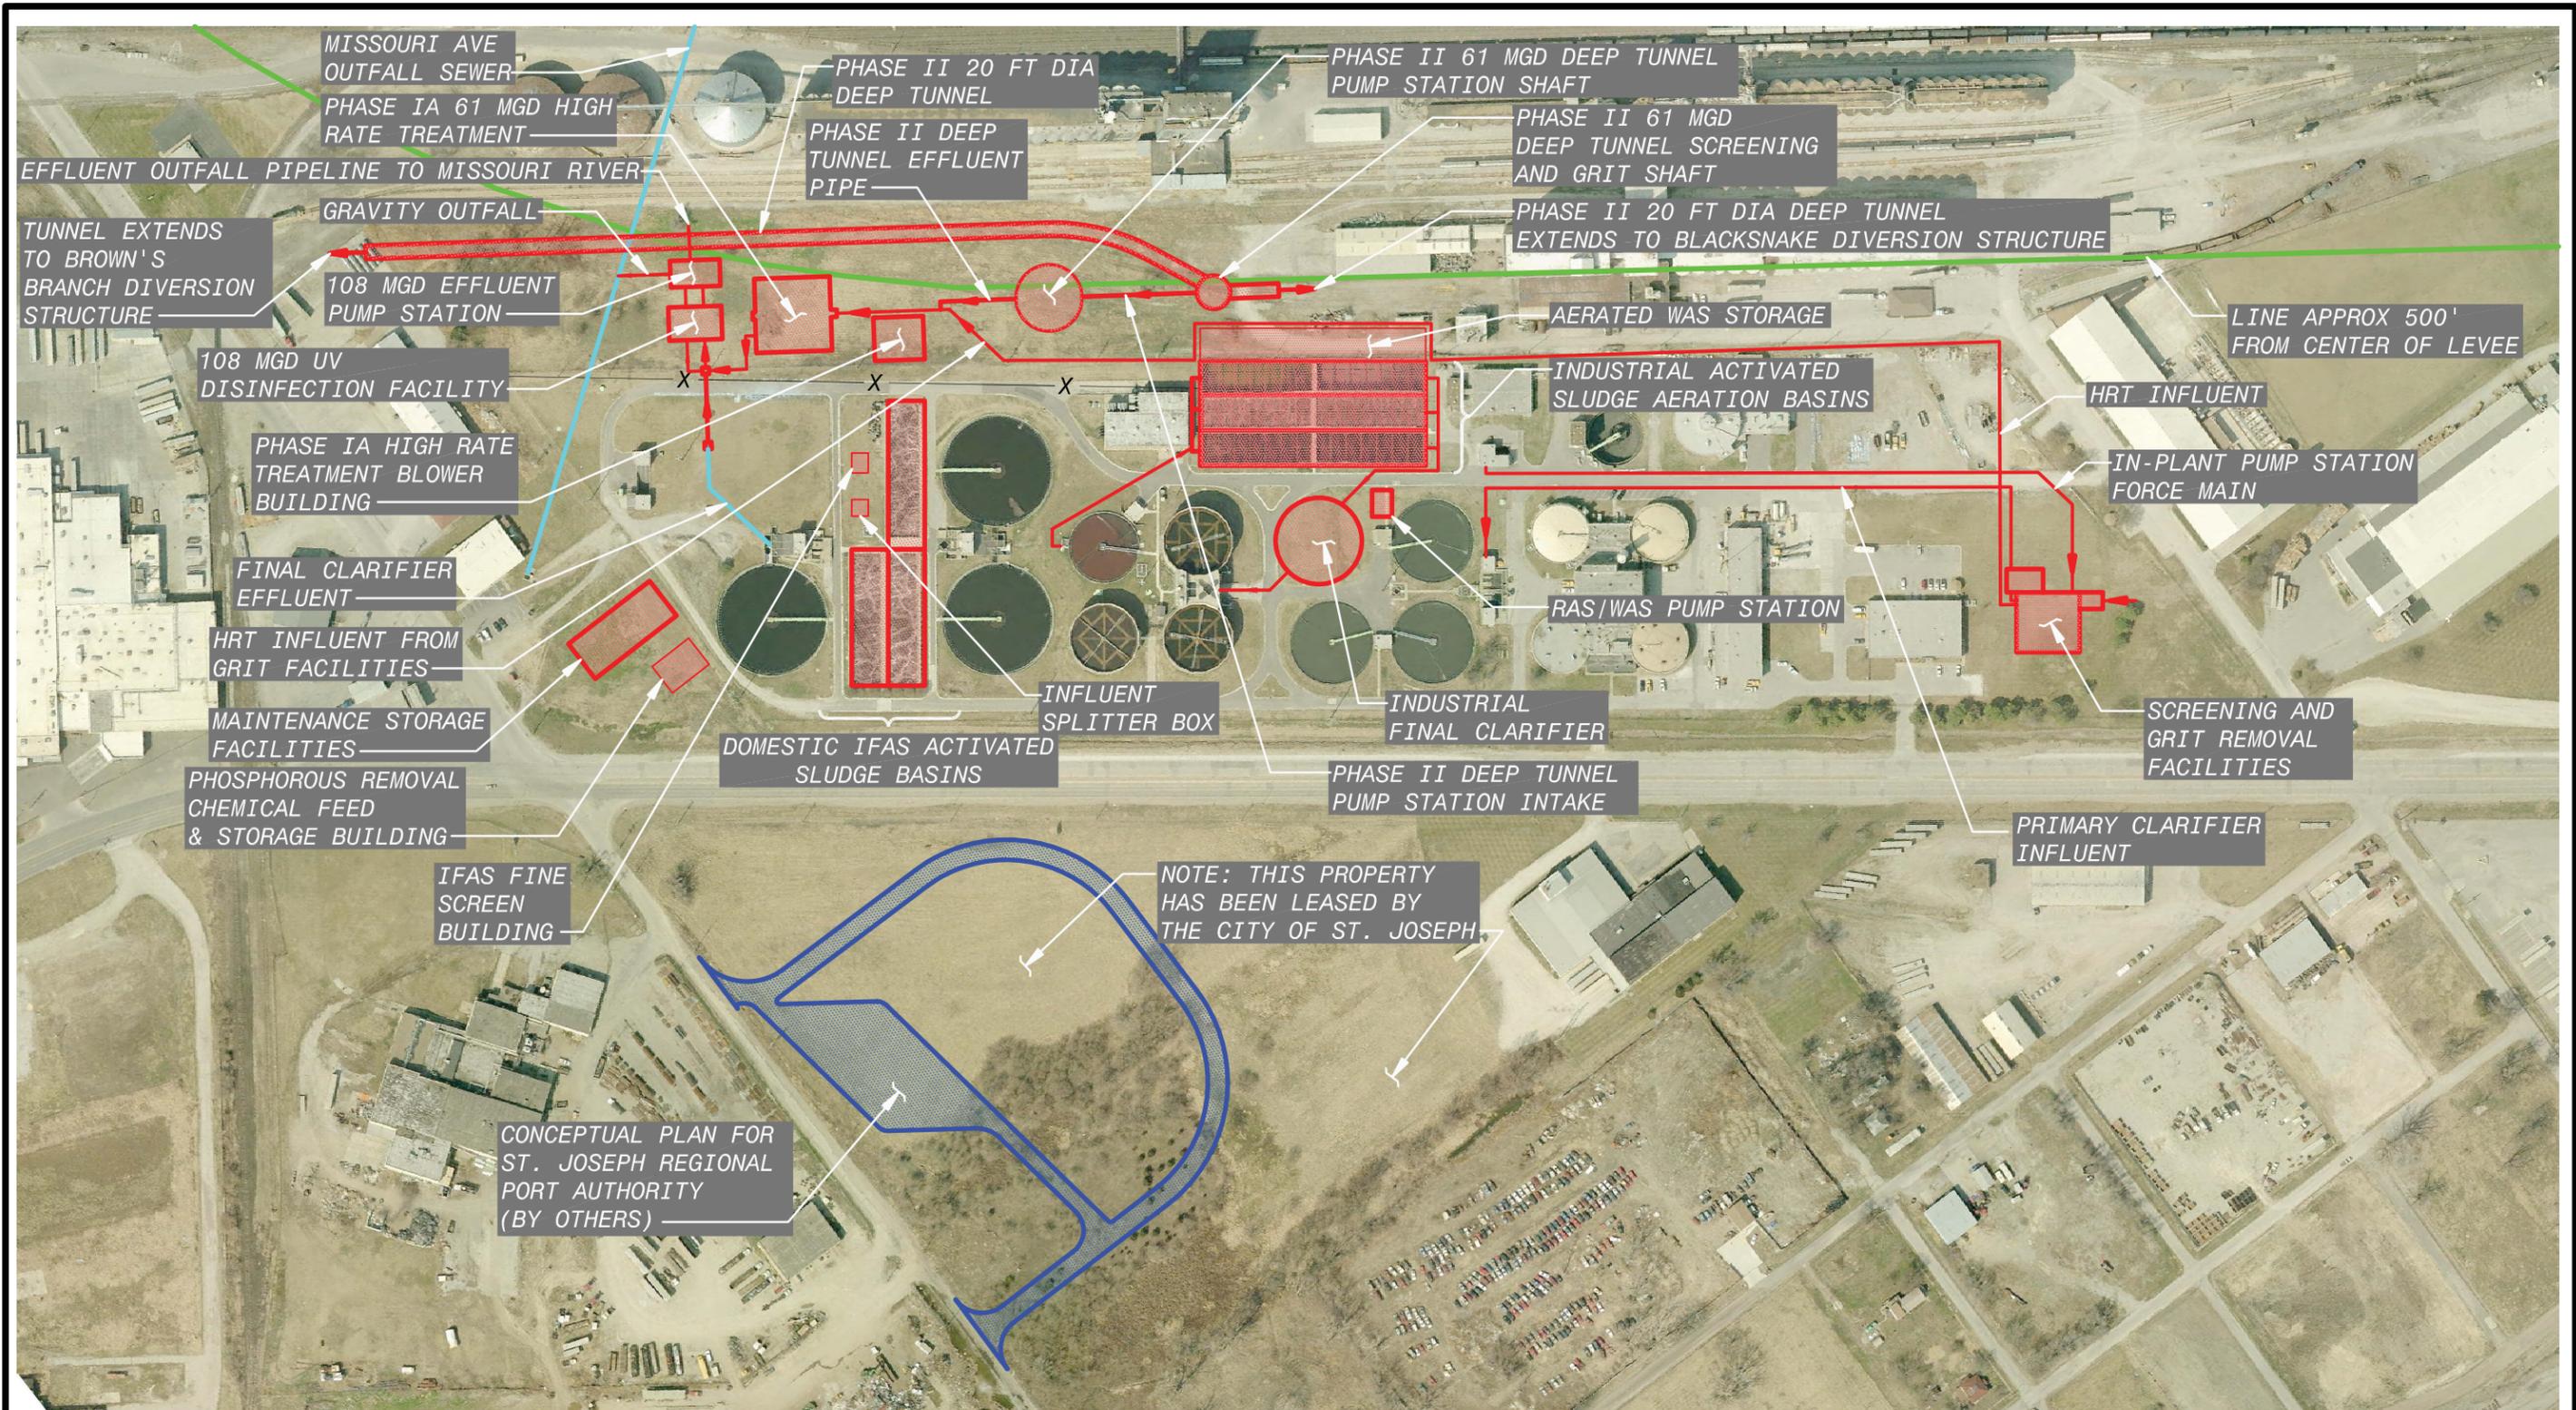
presents a conceptual layout of the aforementioned facilities at the WPF as recommended within the Facilities Plan.
